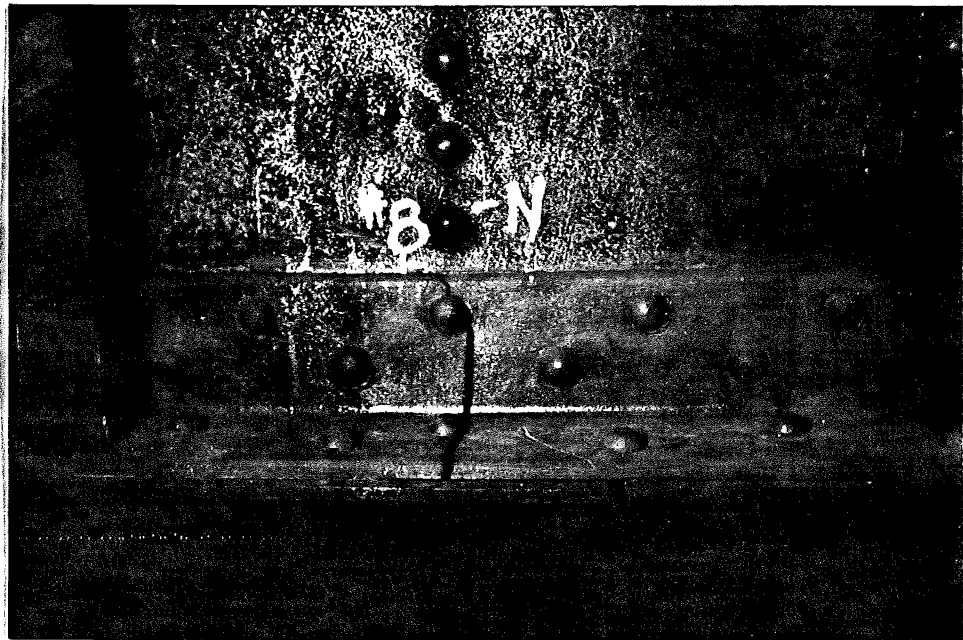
Girder No. 8 at 1,315,000 Cycles
